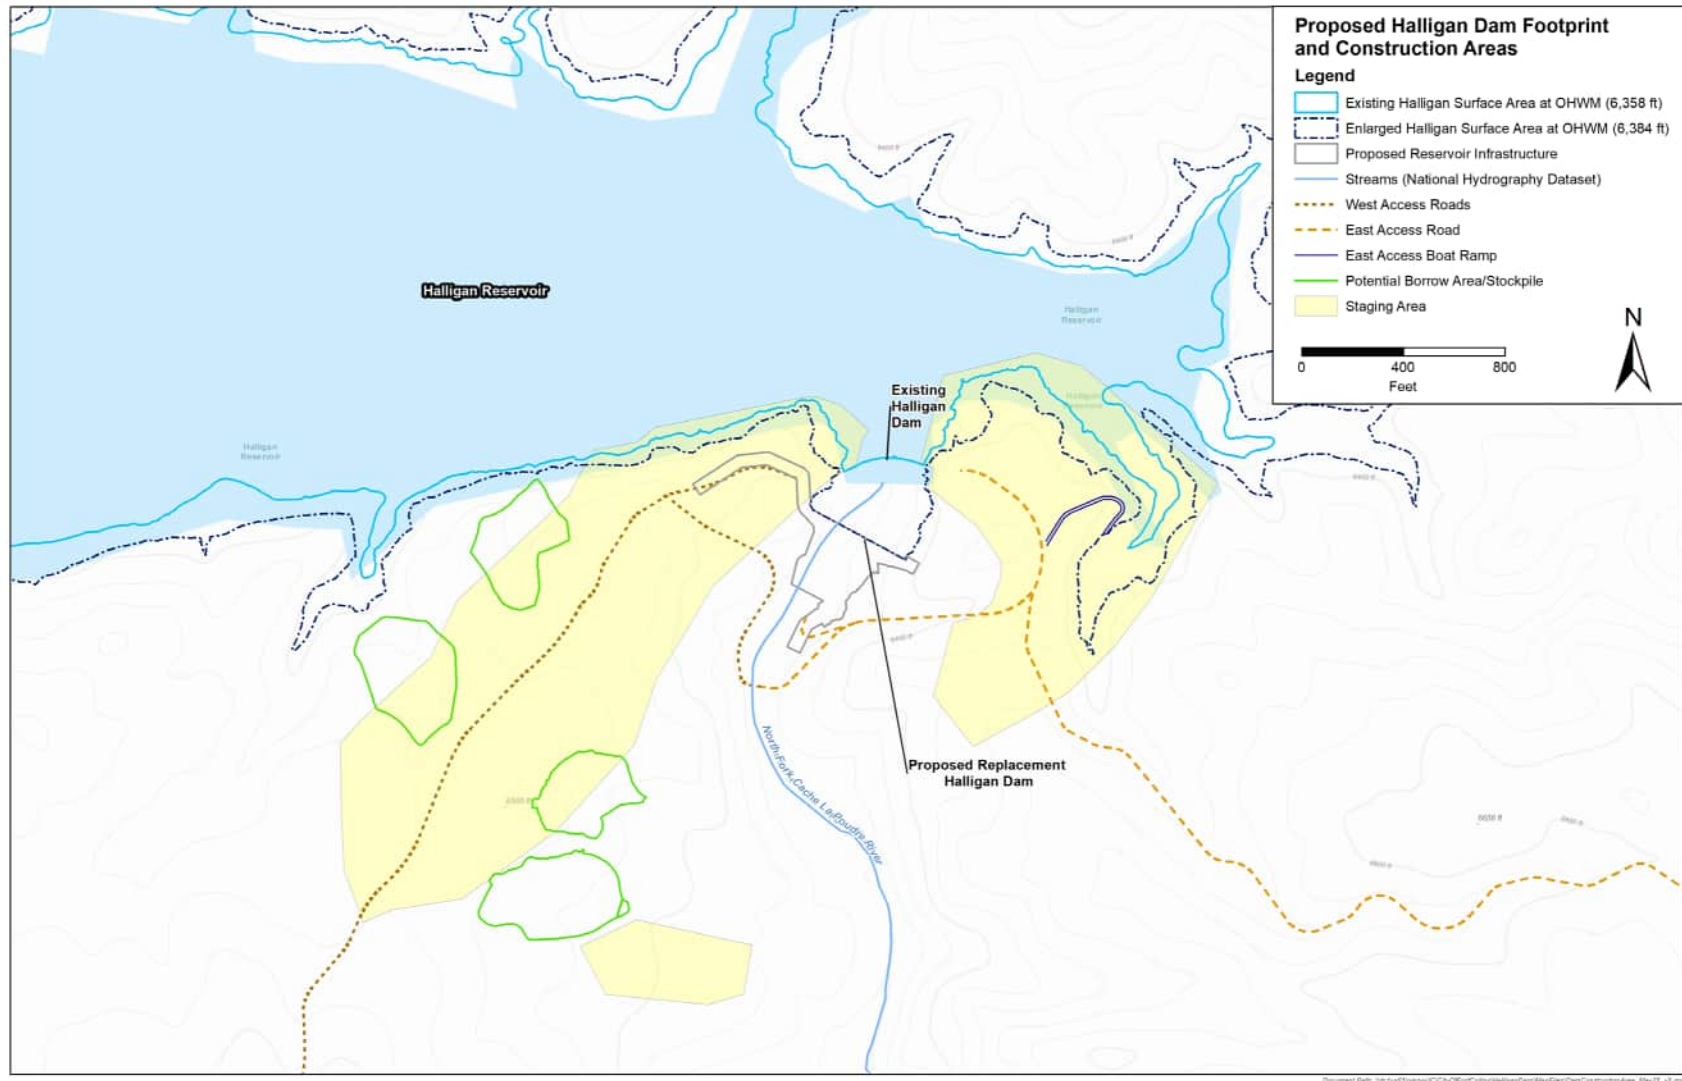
Proposed Halligan Dam Footprint and Construction Areas
